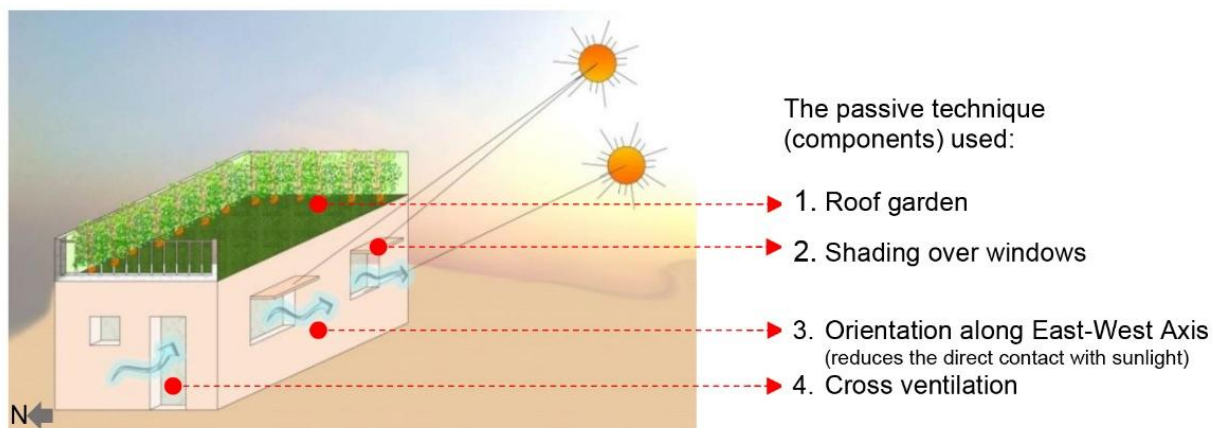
Passive technique to protect the building from heat gain. (Developed by Authors).
